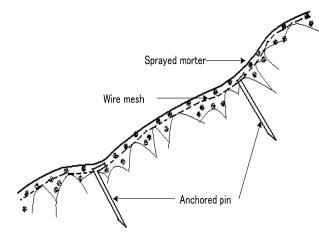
Cross-sectional view of composite and the anchored pin used for slope protection work
